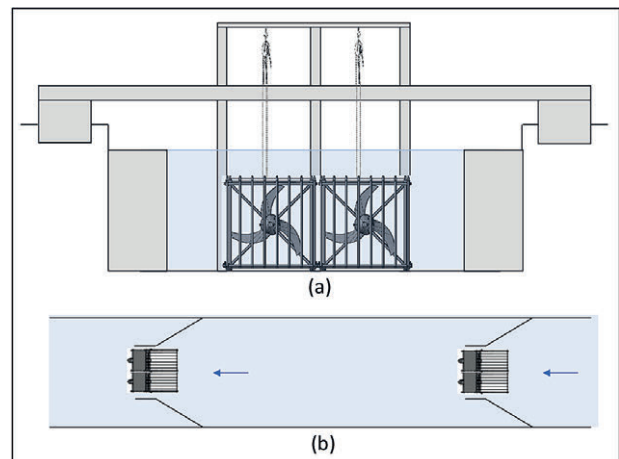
(a) Front view of final design (b) top view of final design with turbines 45 m apart
